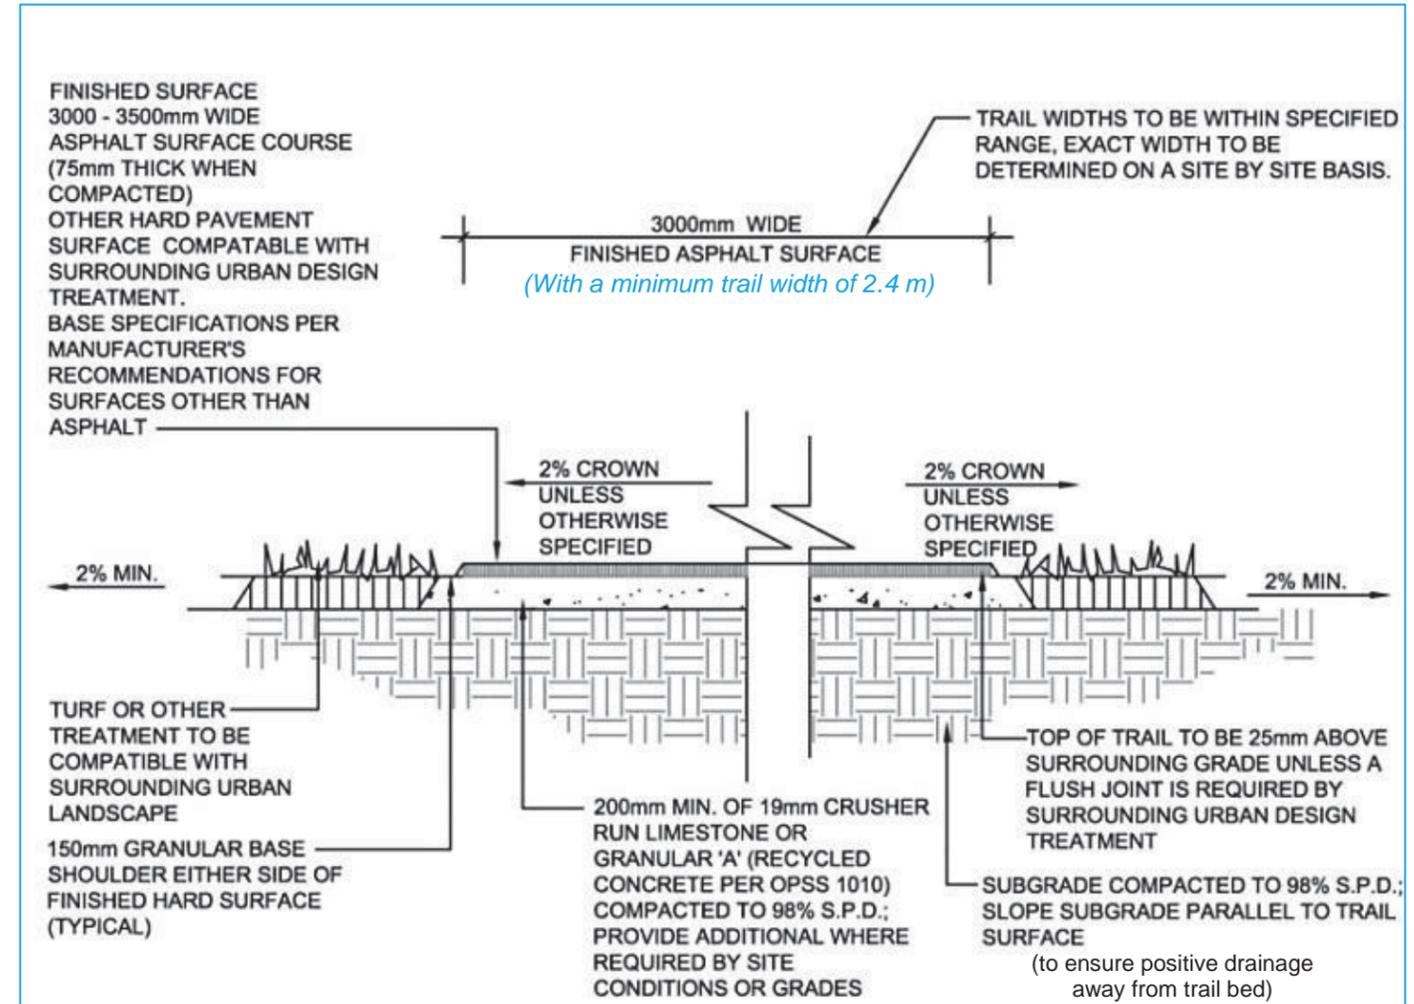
Typical Design Detail - Hard Surfaced Trail
